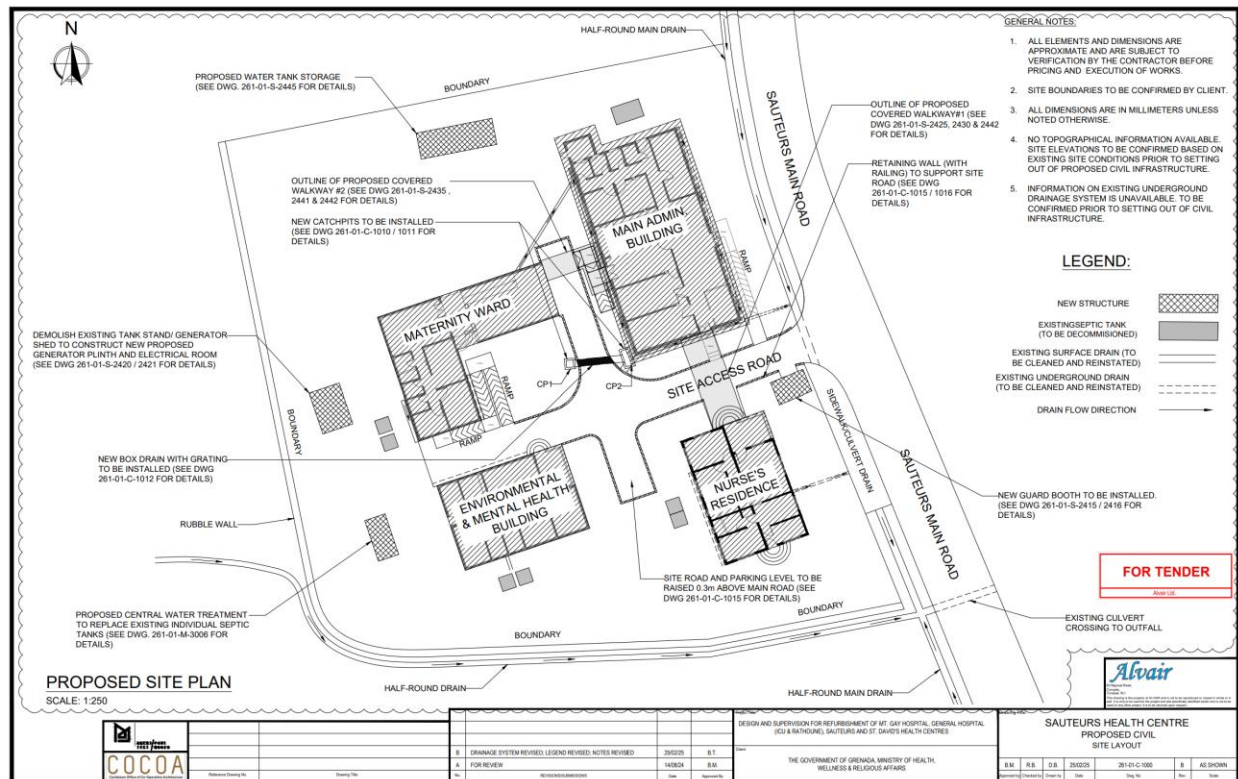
Showing Site Plan of Sauteurs Health Centre
